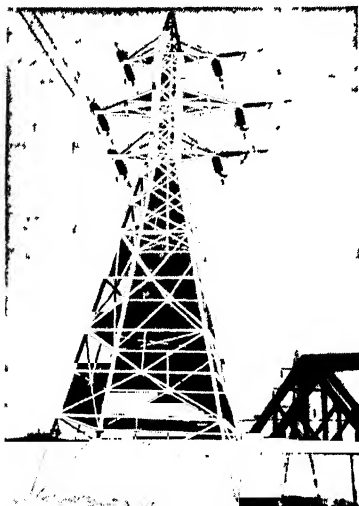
Dead-end tower in a 132,000-volt line. This tower is a great deal larger at the base and has considerably more bracing than a straight line or tangent tower. Note the use of two insulator strings in place of one. At a dead end the insulator string must not only support the conductor but must also offset the tension in the line. Ordinarily the string hangs vertically and only supports the weight of the conductor. The branch line turning to the right is a short span, and therefore one string is adequate. (Courtesy Wisconsin Electric Power Co.)
